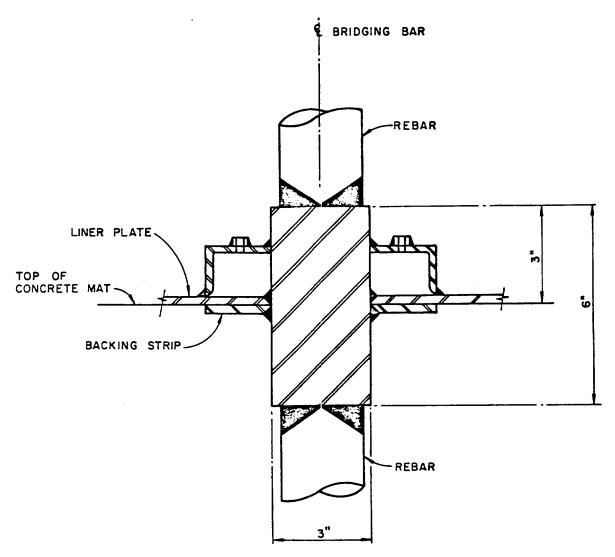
SECTION: TYPICAL BRIDGING BAR (SHEET 2)
